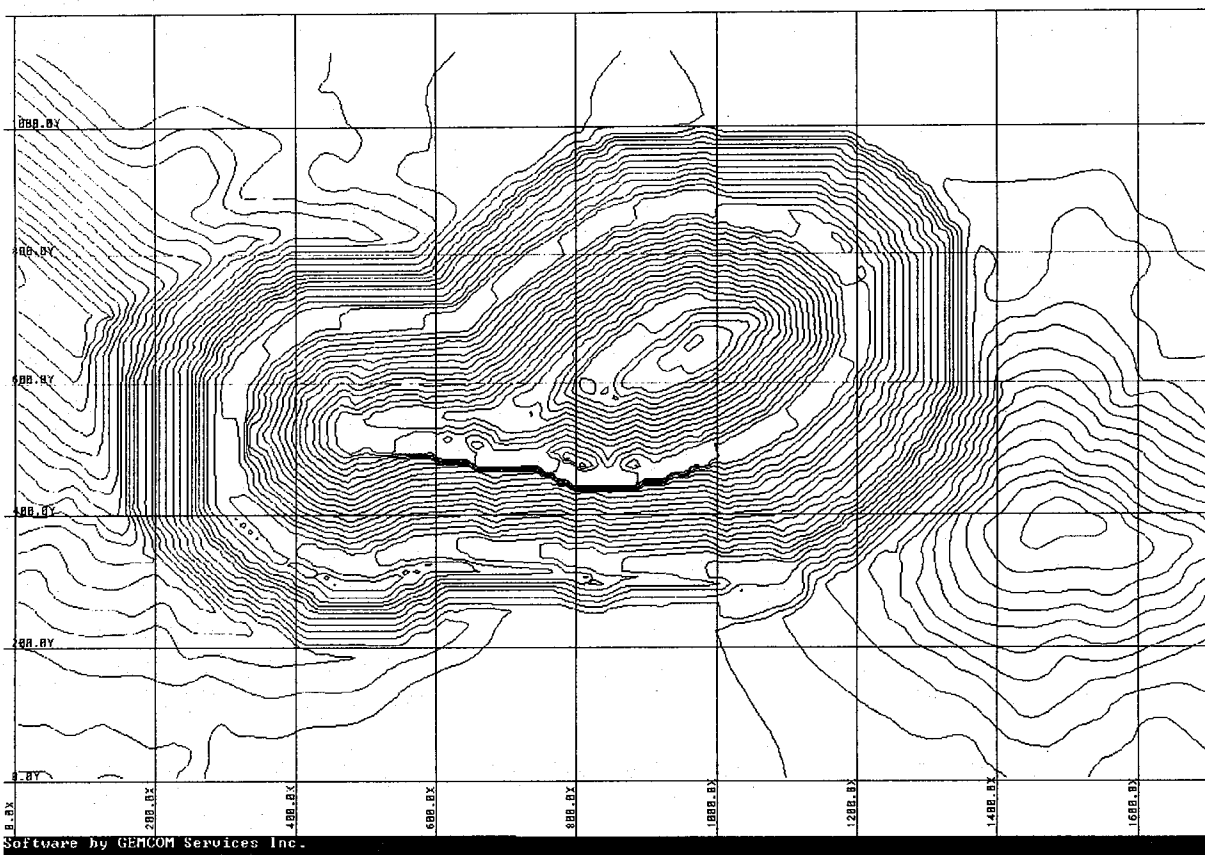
Pit # 5 - Whittle pit 1, first ramp attempt. Note ramp and slope conflicts.
